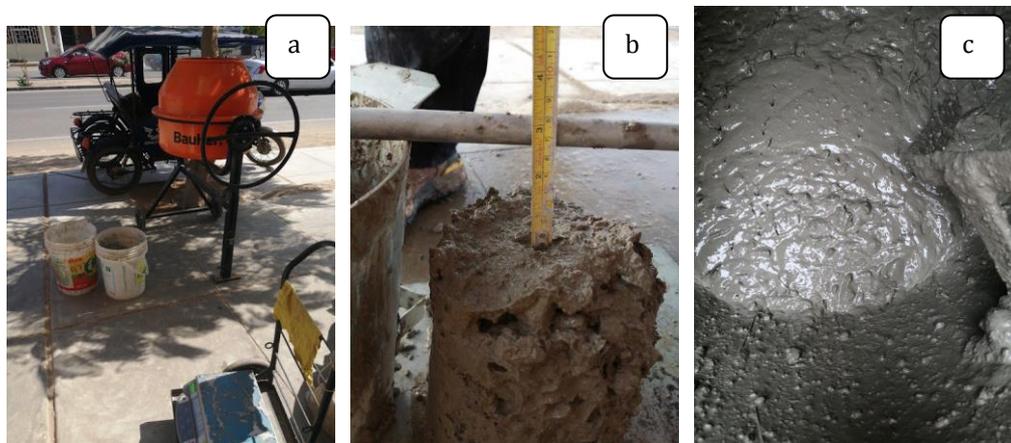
(a) Elements used for concrete preparation, (b) Slump measurement, (c) Concrete mixed with fiber additions
